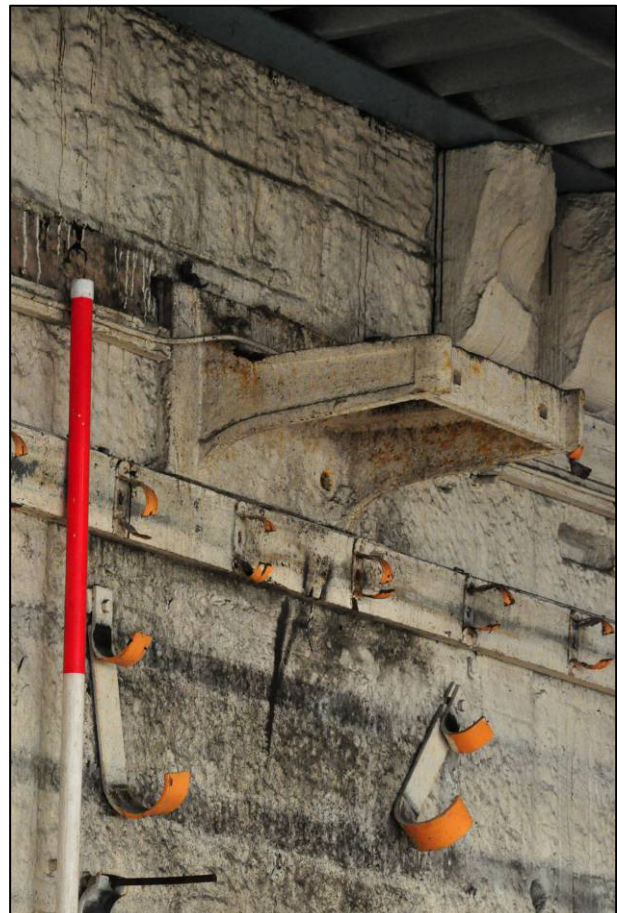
Weaving shed (Unit C), west end of south wall, showing transmission bracket, looking SW (photo 11695).
